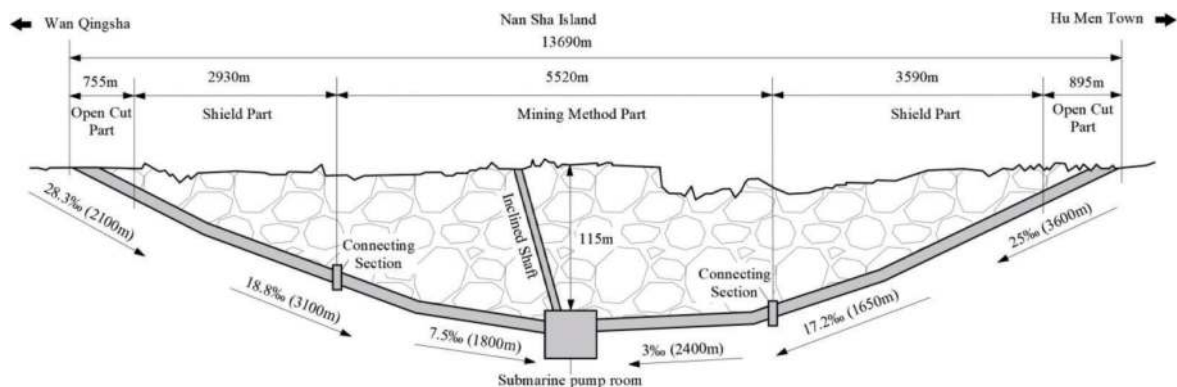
Longitudinal section of the Zhujiangkou Tunnel.
